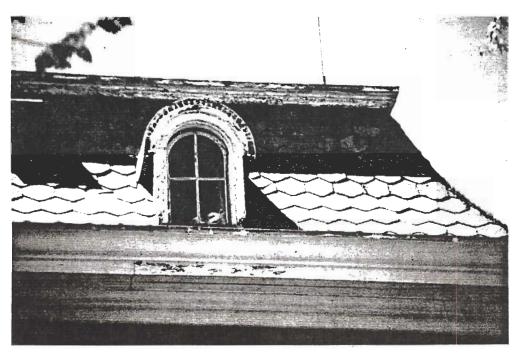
Detail at Mansard Slate Roof, Wood Cornice and Circleheaded Dormer.
